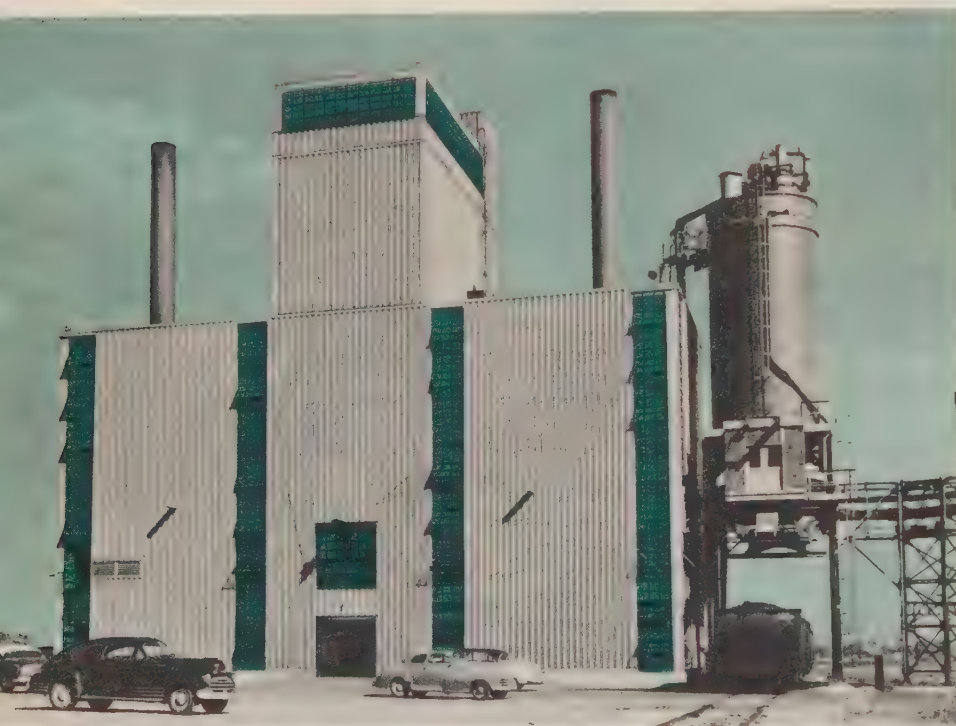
AC Spark Plug Division's new power plant. The problem was to house two 80,000 lb-per-hr steam-generating units immediately, yet provide easy expansion for four future similar units. Silo at right is of vitrified, glazed tile and is used for storage of ash.
